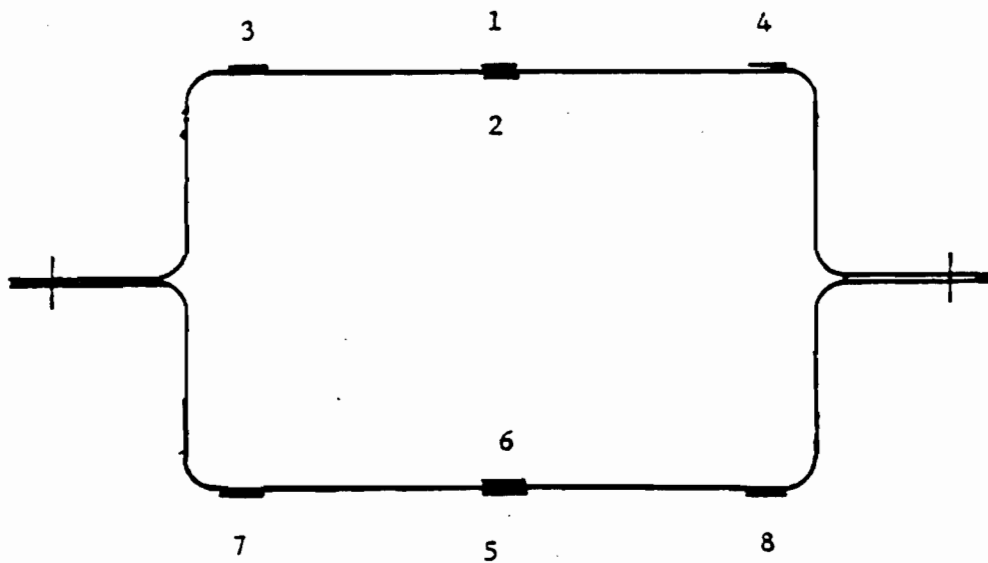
Locations of Strain Gages at Midheight of Box-Shaped Stub Columns
